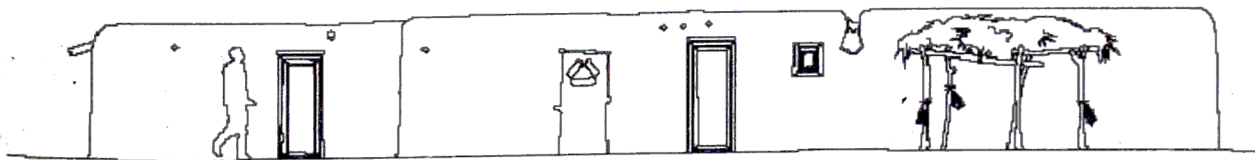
; Elevation of typical household in Kaleo (Source: On-site measured AutoCAD drawing)
